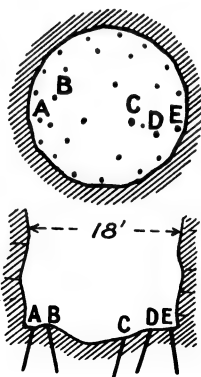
Position of Sumping and CancH Holes at Bottom of a Shaft.
